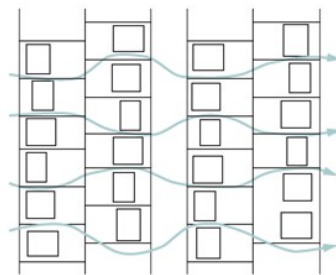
In subdivisions, plan for single house lots to be staggered which then staggers the houses and enables more uniform air flow throughout the subdivision. It reduces dead air zones created by one house blocking air flow to the next house, which occurs in a traditional planning grid layout.
